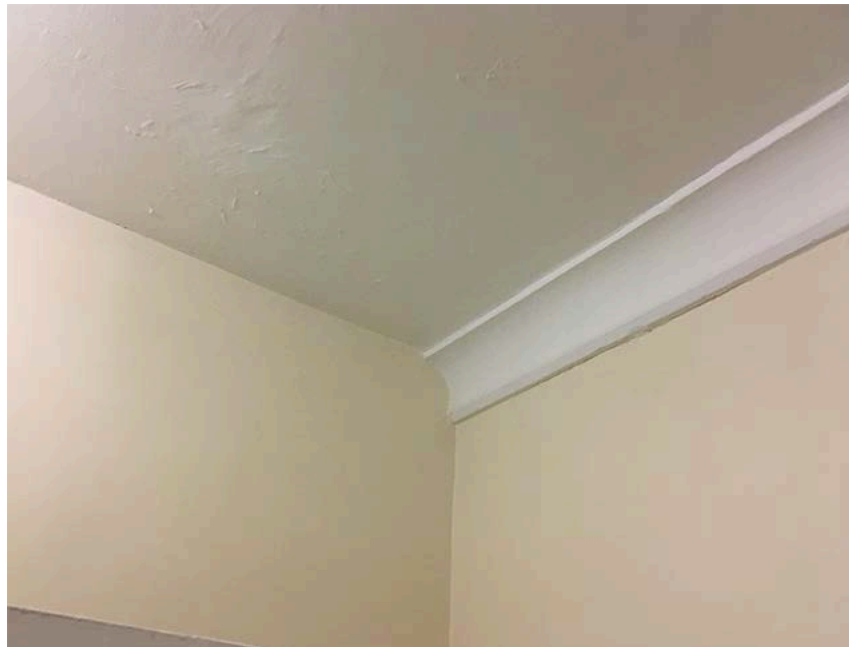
Detail of original covered cornice interrupted by a later partition wall in the Ladies lavatories.
